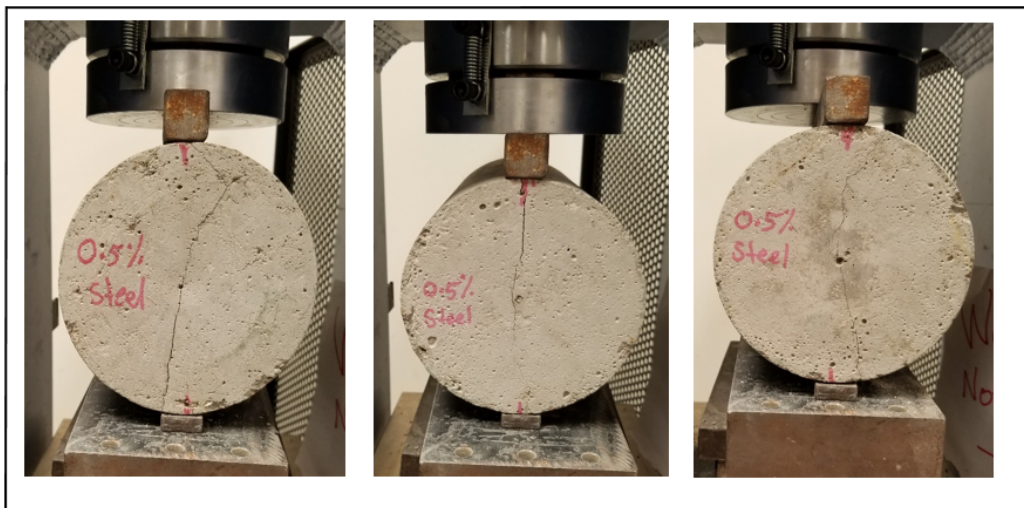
20. Cylinder Tensile Failure SFRC0.5%
